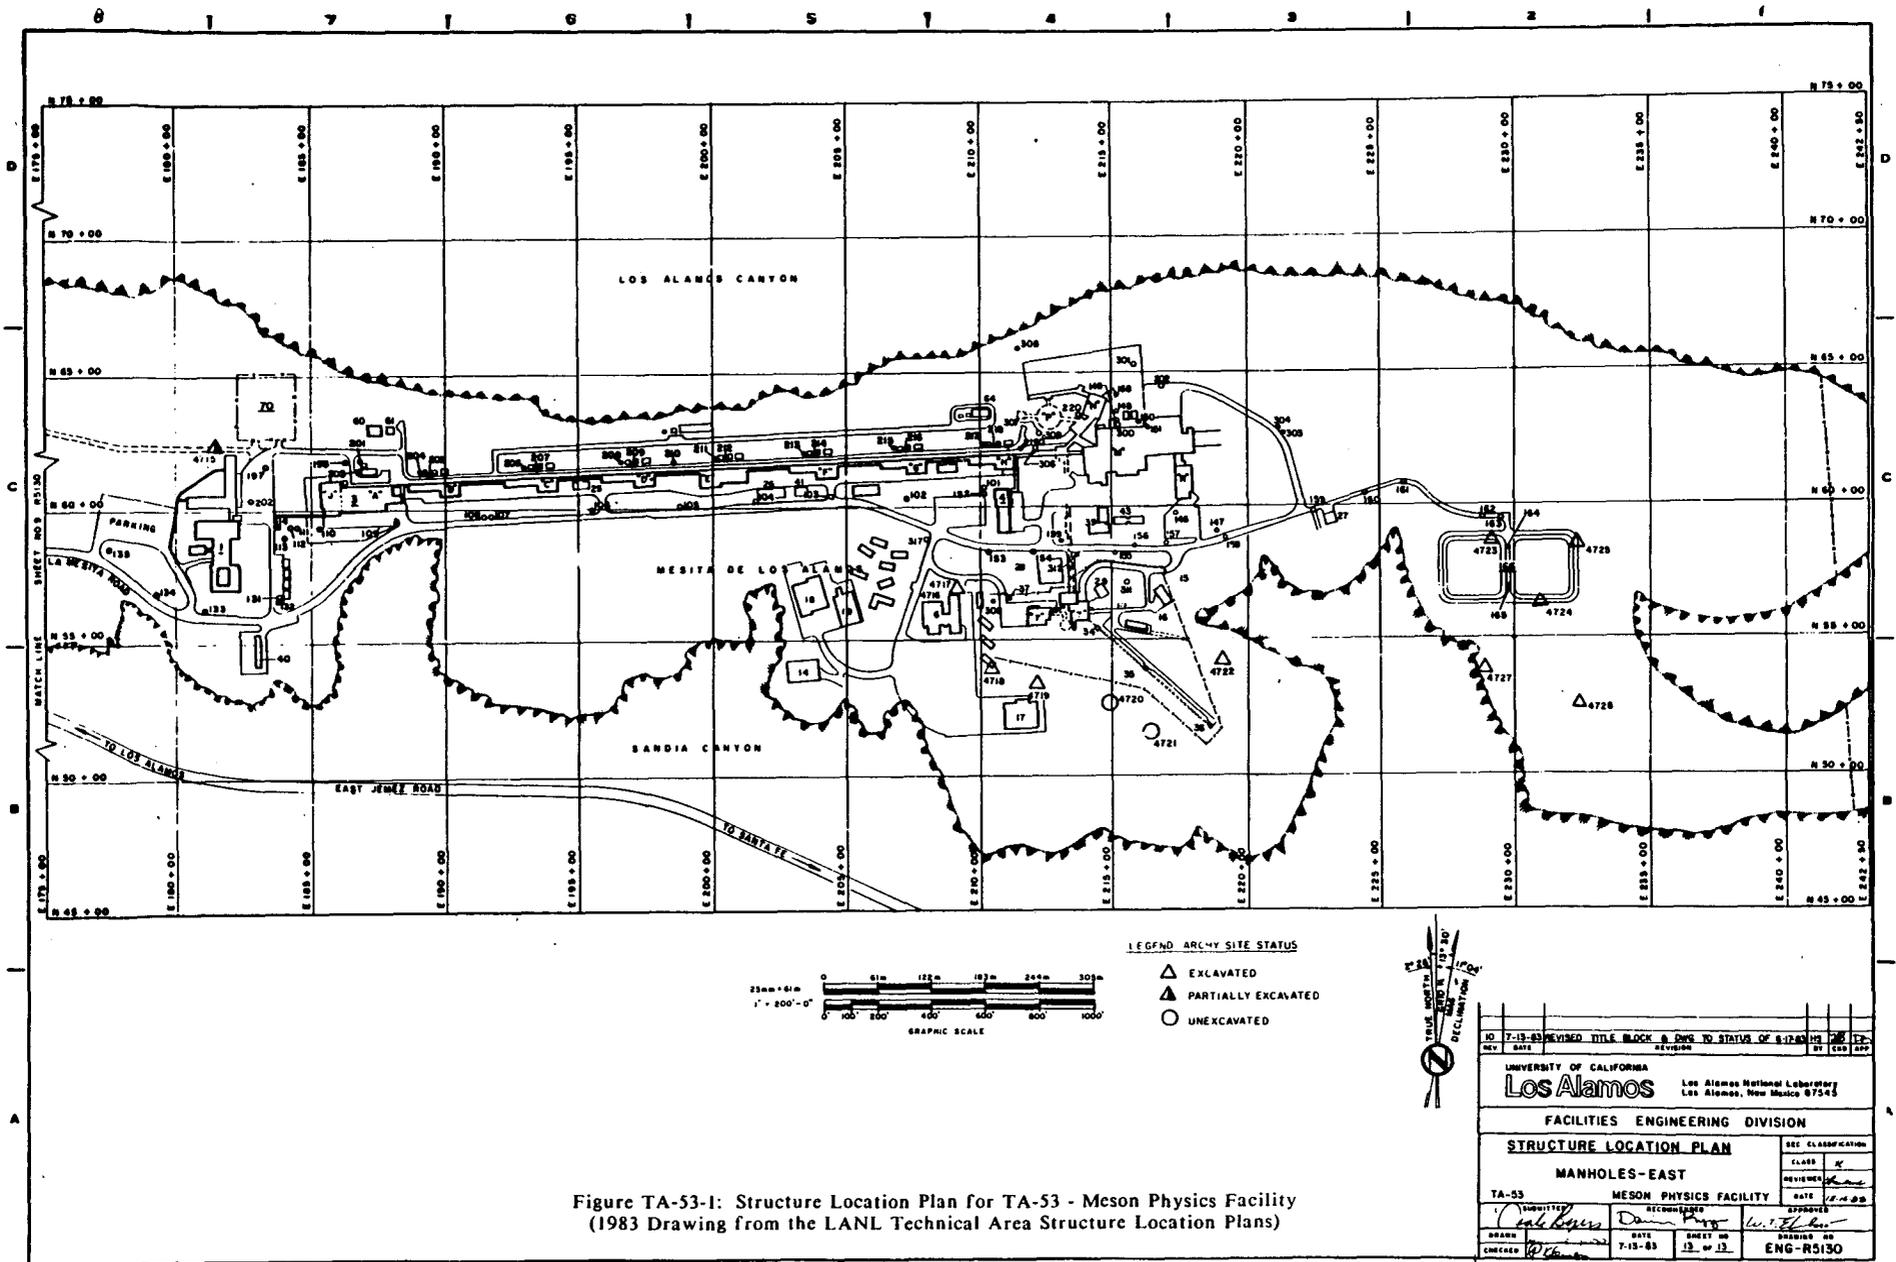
Structure Location Plan for TA-53 - Meson Physics Facility (1983 Drawing from the LANL Technical Area Structure Location Plans)
